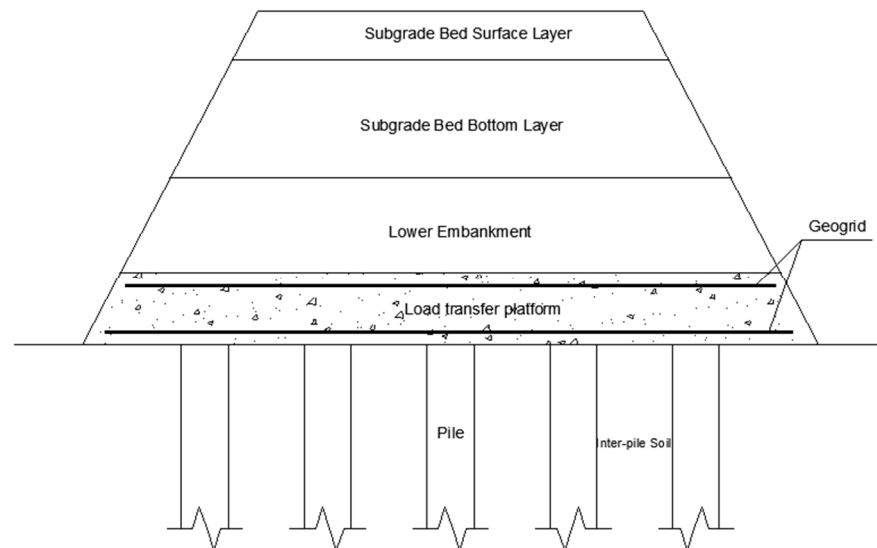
The schematic diagram of pile-supported geosynthetic-reinforced embankment.
